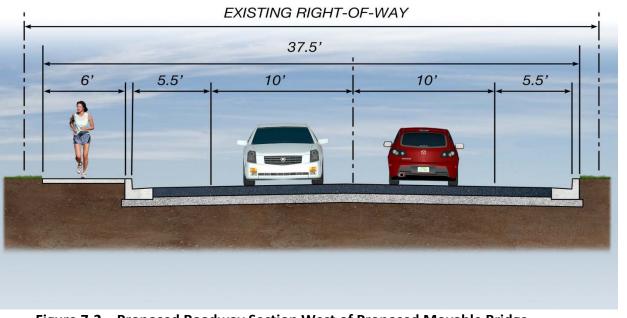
Proposed Roadway Section West of Proposed Movable Bridge
